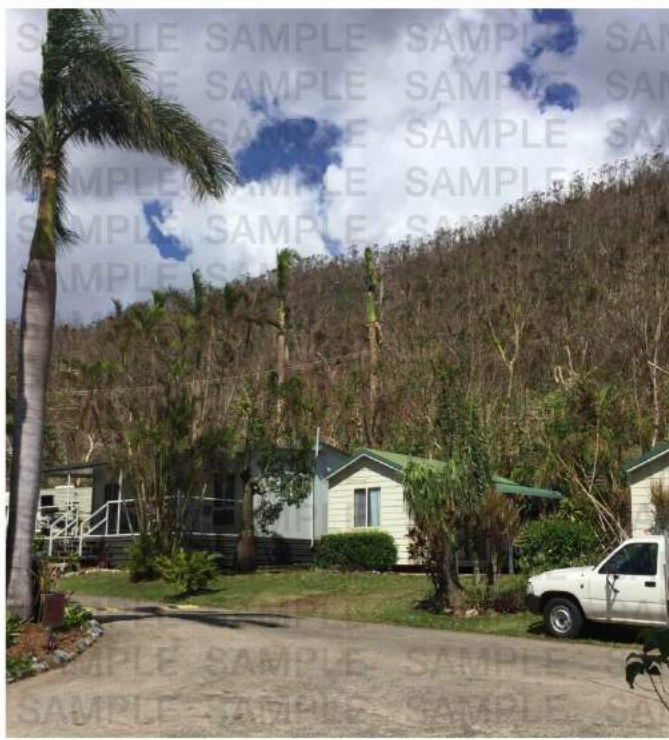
Street facing villas have recieved inundation due to extreme runoff from
